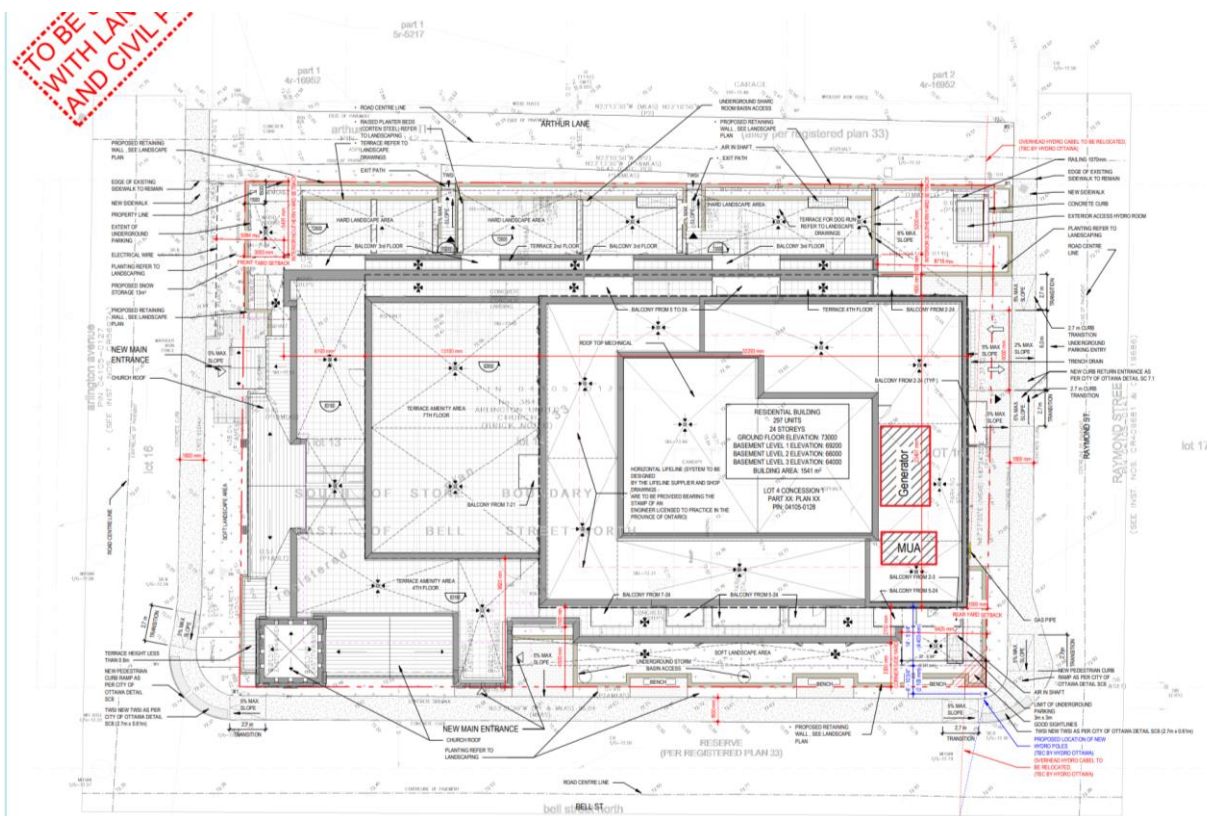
Site plan of the proposed development, excluding landscape and civil details. The existing west entrance at the southwest corner and the existing secondary entrance at the northeast corner are being retained and will form the primary entrances to the development. The existing main entrance at the northwest corner is being retained and will provide access to a landscaped terrace for one of the residential units. A rooftop amenity area extending along Bell and Arlington at the roof level of the retained church facades is being proposed. Source: Neuf May 16, 2024.
